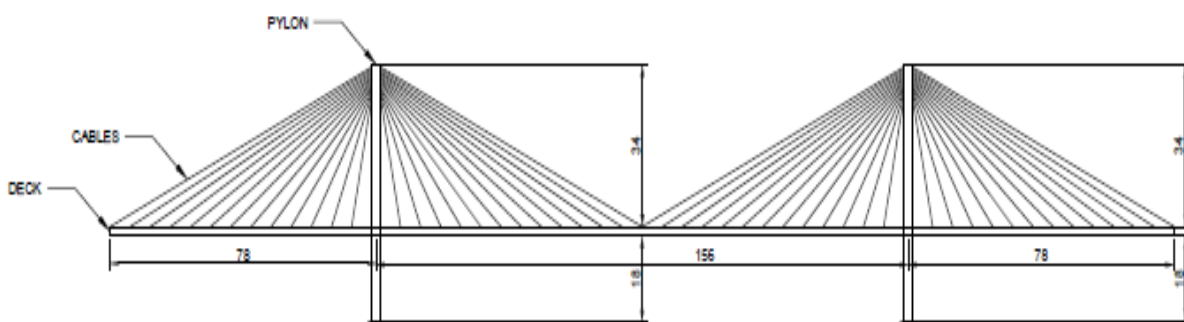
longitudinal section of cable stayed bridge (all dimension in m)
